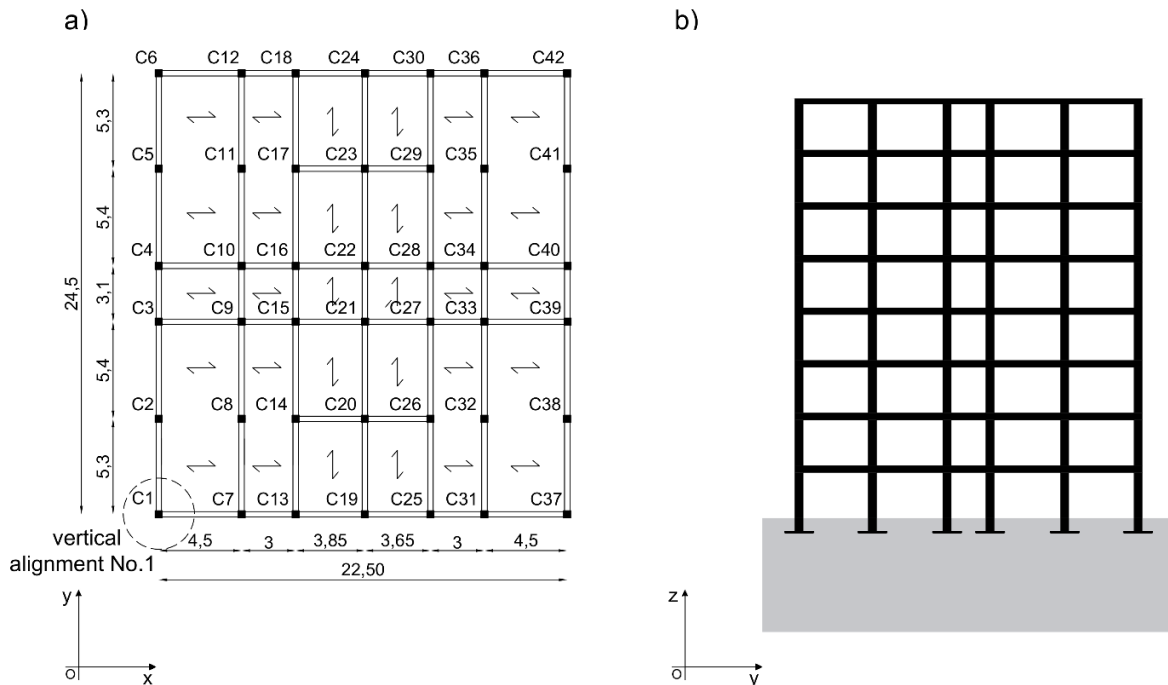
a) Plan view and b) vertical section of the RC frame structure.
